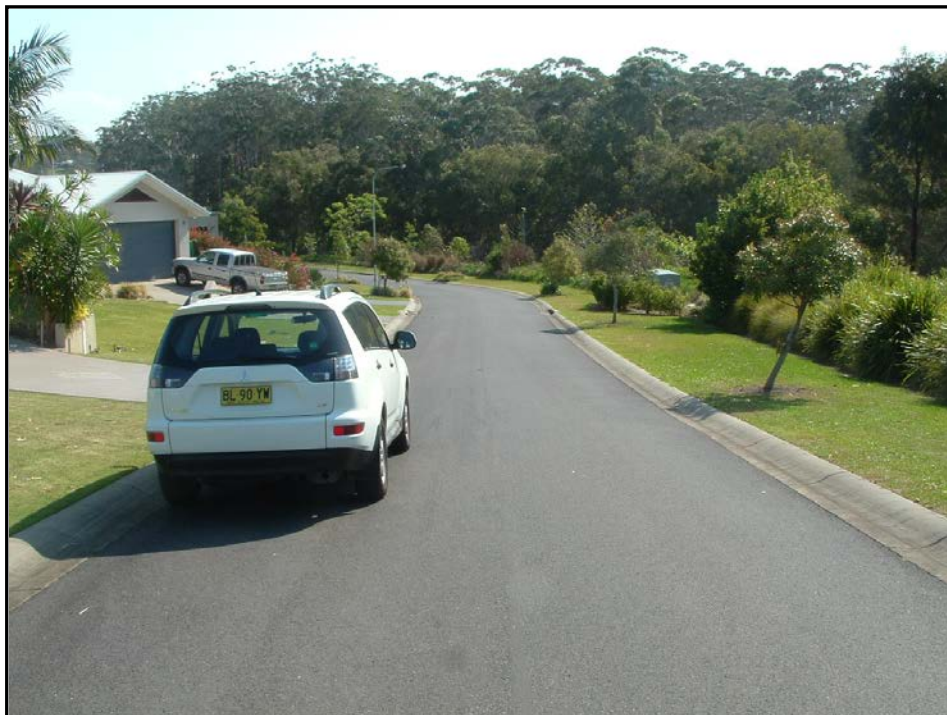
View along Tidal Crescent showing reduced road width (5.5 metres)
